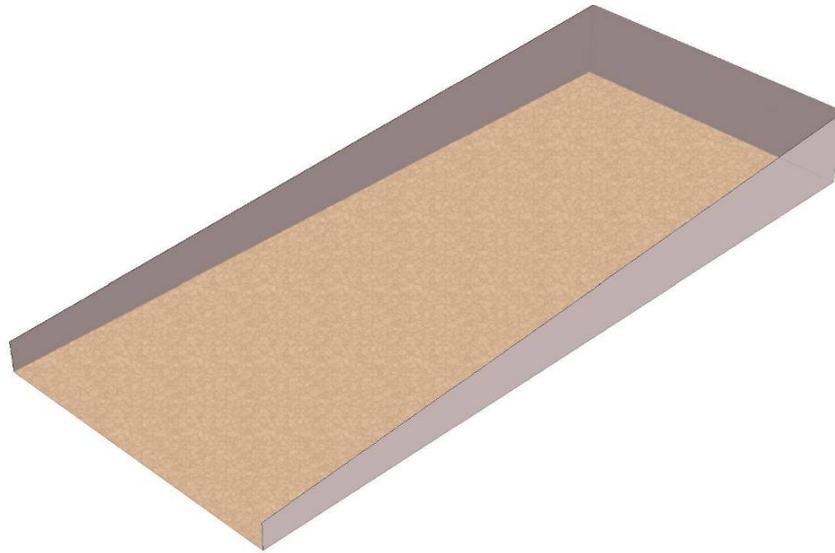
Construction process-step 1: digging the pit (General layout of the pit).
